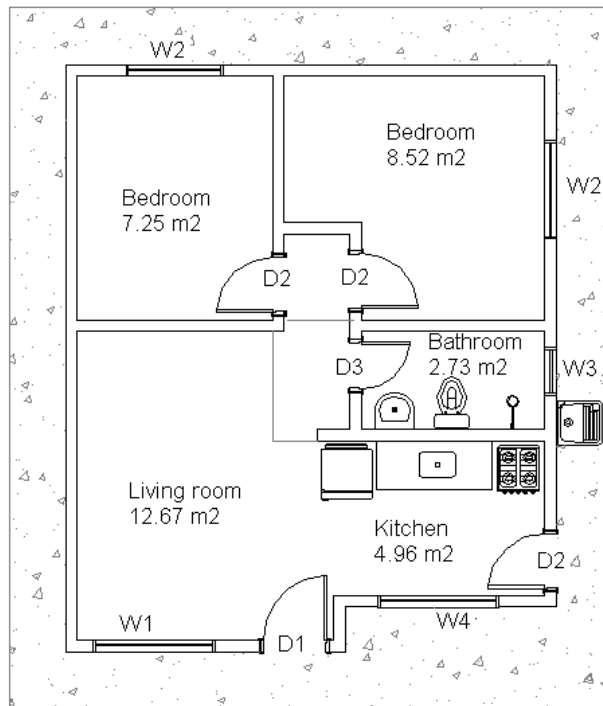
Project of the house front – Brazilian Association of Portland Cement (ABCP).
